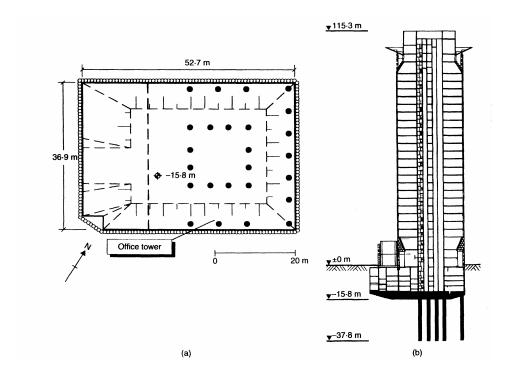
Japan-Centre building: a) ground plan b) sectional elevation (Katzenbach et al., 2005)
